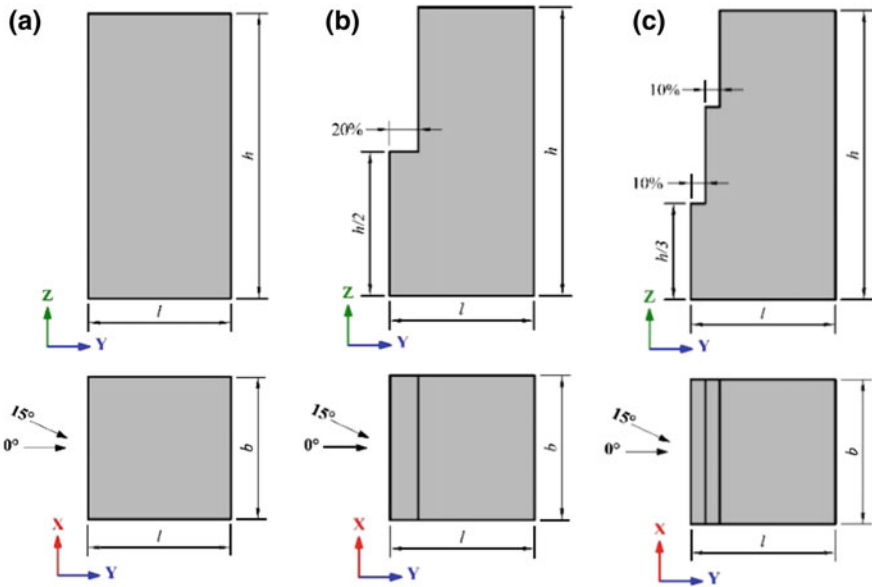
Elevation and plan of model. a S1, b S2 and c S3
